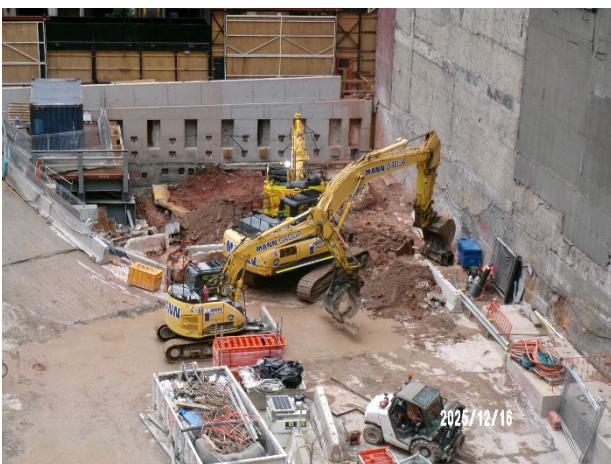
Hunter Street East: Location of strip footing adjacent 16 O'Connell Street.
